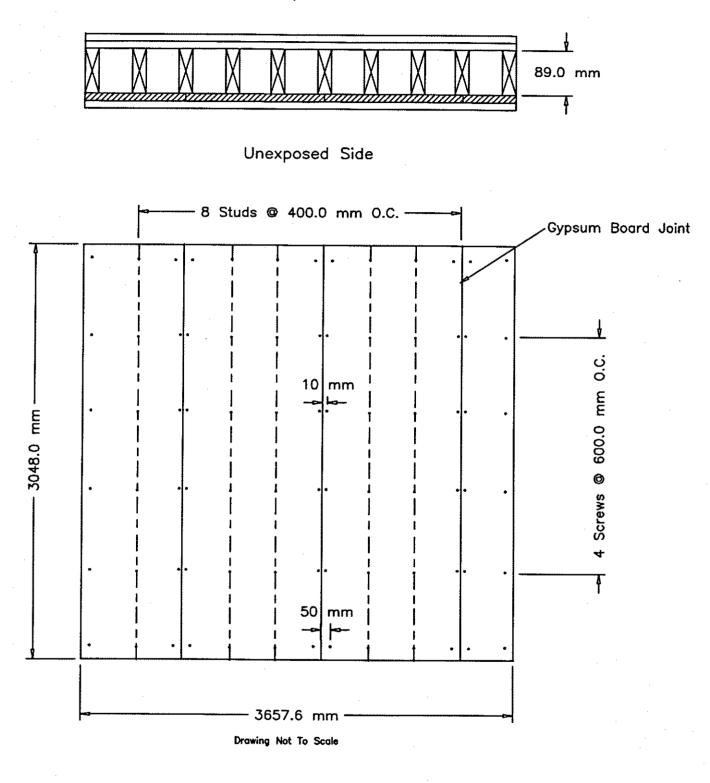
Screw Locations For Wood Stud, 2x2 Gypsum Board Layers, Full-Scale Assembly, Base Layer Gypsum Board, Unexposed Face
